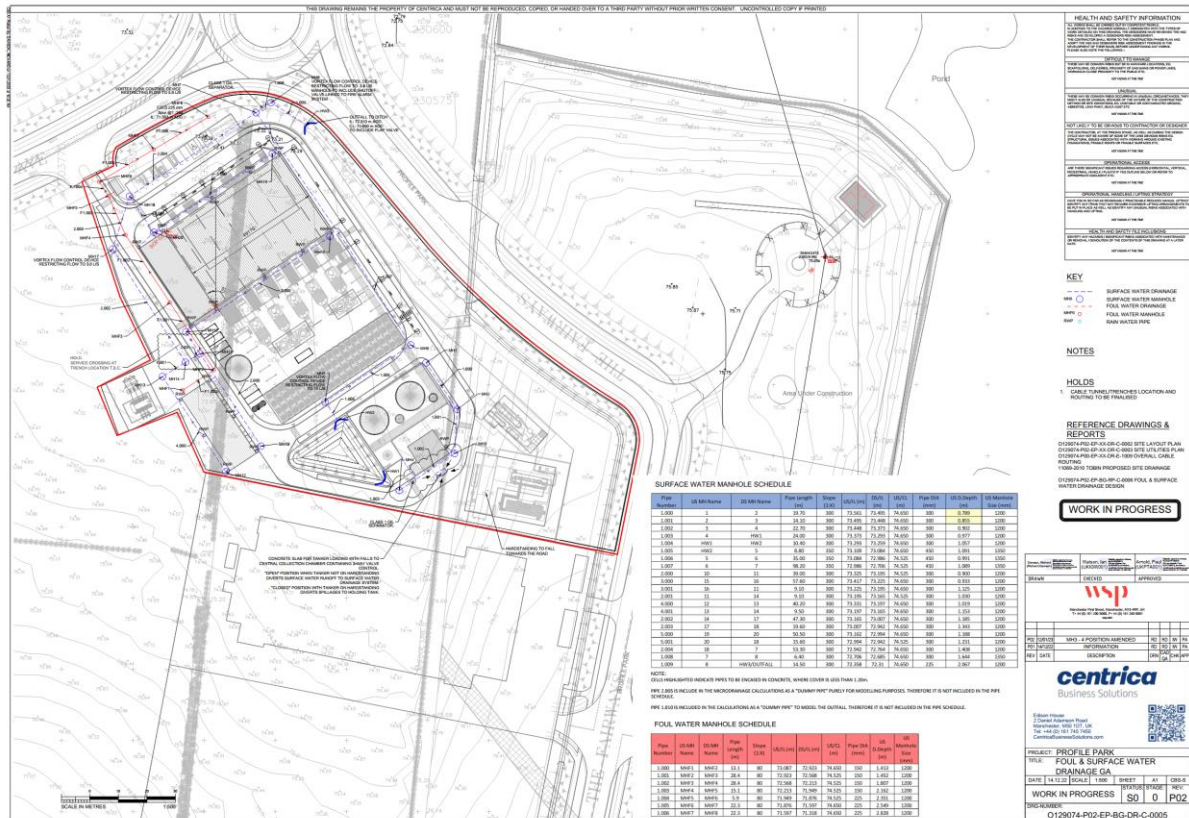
Drainage Construction Drawing for Power Plant Site
